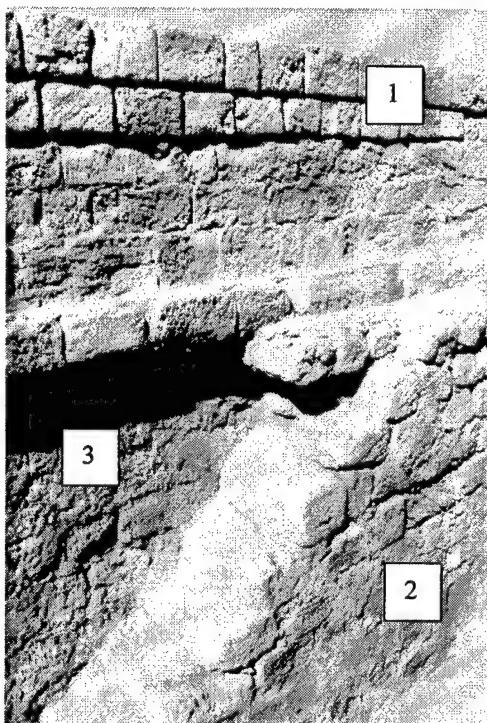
Face of South Wall Section. (View south, interior). Multiple construction phases: (1) Crusader repair, (2) Islamic city wall, (3) Byzantine breakwater.
